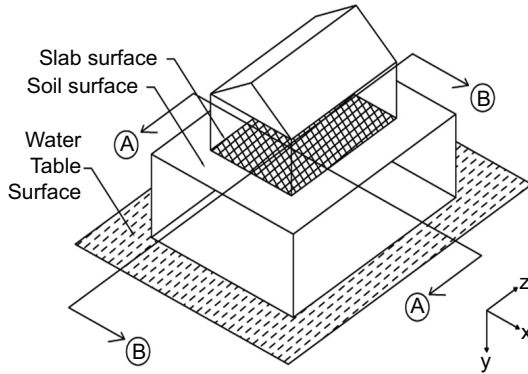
A rectangular slab-on-grade floor foundation model with partial floor insulation. (a) slab-on-grade floor foundation for a typical building above soil medium.
